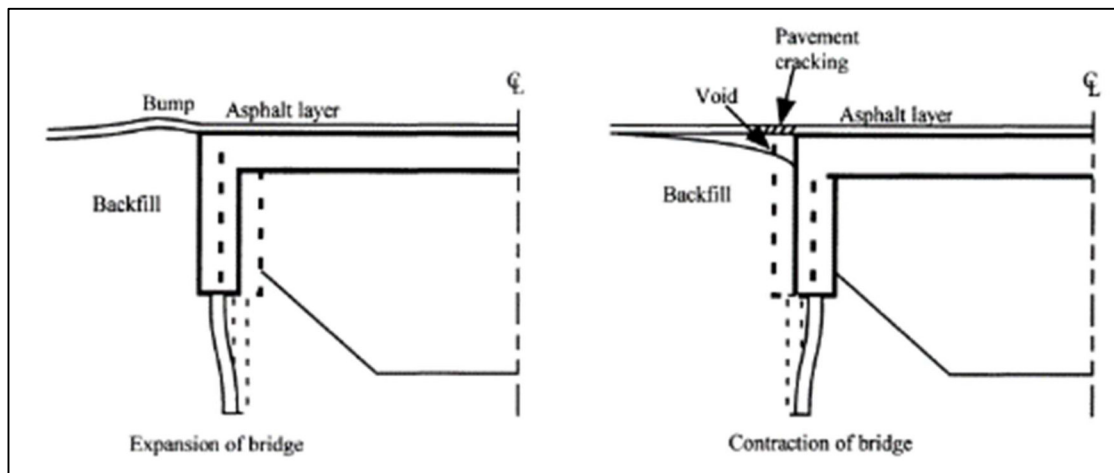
Types of structural damage due to longitudinal displacement of the bridge deck (Dreier, Burdet, Muttoni, 2011)
